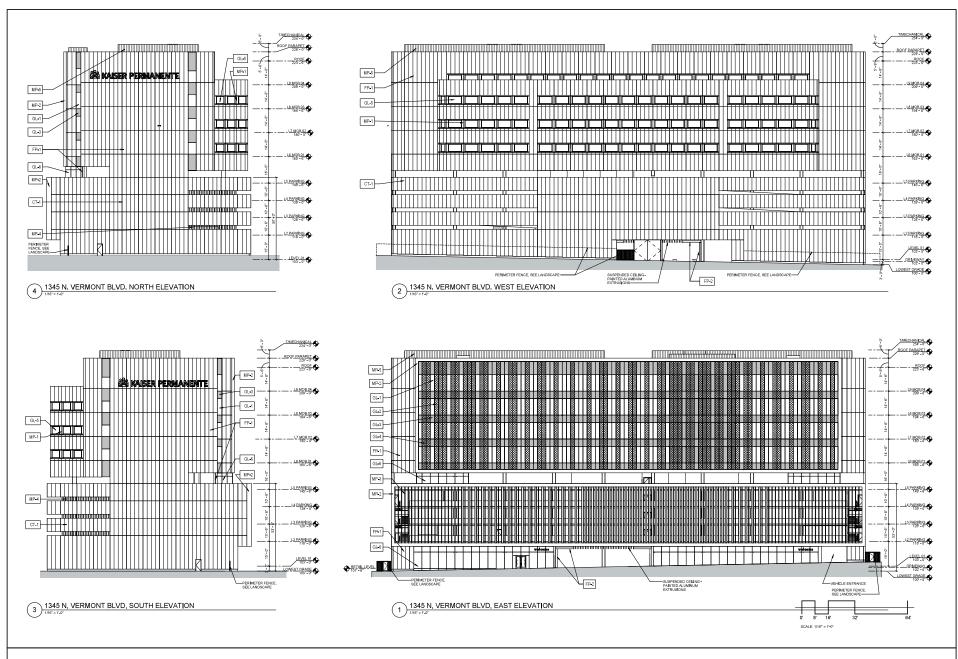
Elevations of Proposed Project: Site 1 Development
